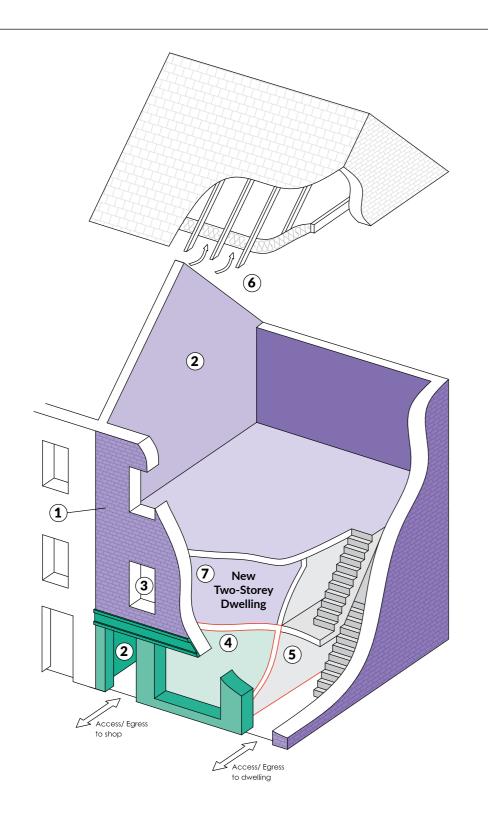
Type 4 Multi-Storey Building (Non-Dwelling)
